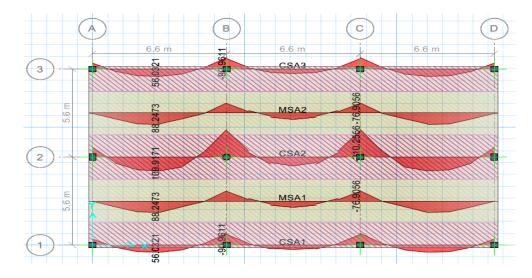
C.S & M.S along longer direction(SAFE:ACI ,without staggered column)
